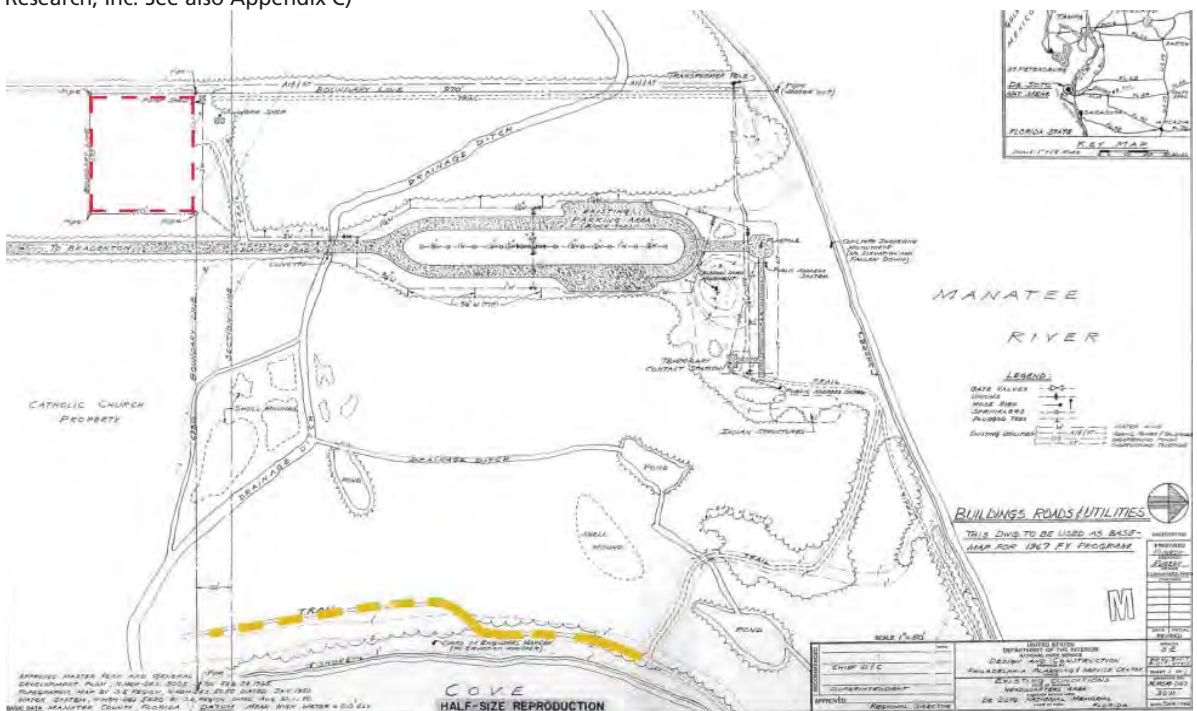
Existing Conditions Plan for Headquarters Area, NPS EODC, June 1966, drawing no. NMEM-DES 3011. Although done much later, this drawing fairly well reflects the as-built condition of the park circa 1952; the only later additions shown are the “Indian Structures;” a 0.6-acre 1960 property acquisition (red dashed line added); and the trail along the south half of the cove (yellow dashed line added). (DESO Archives. See also Appendix C)
